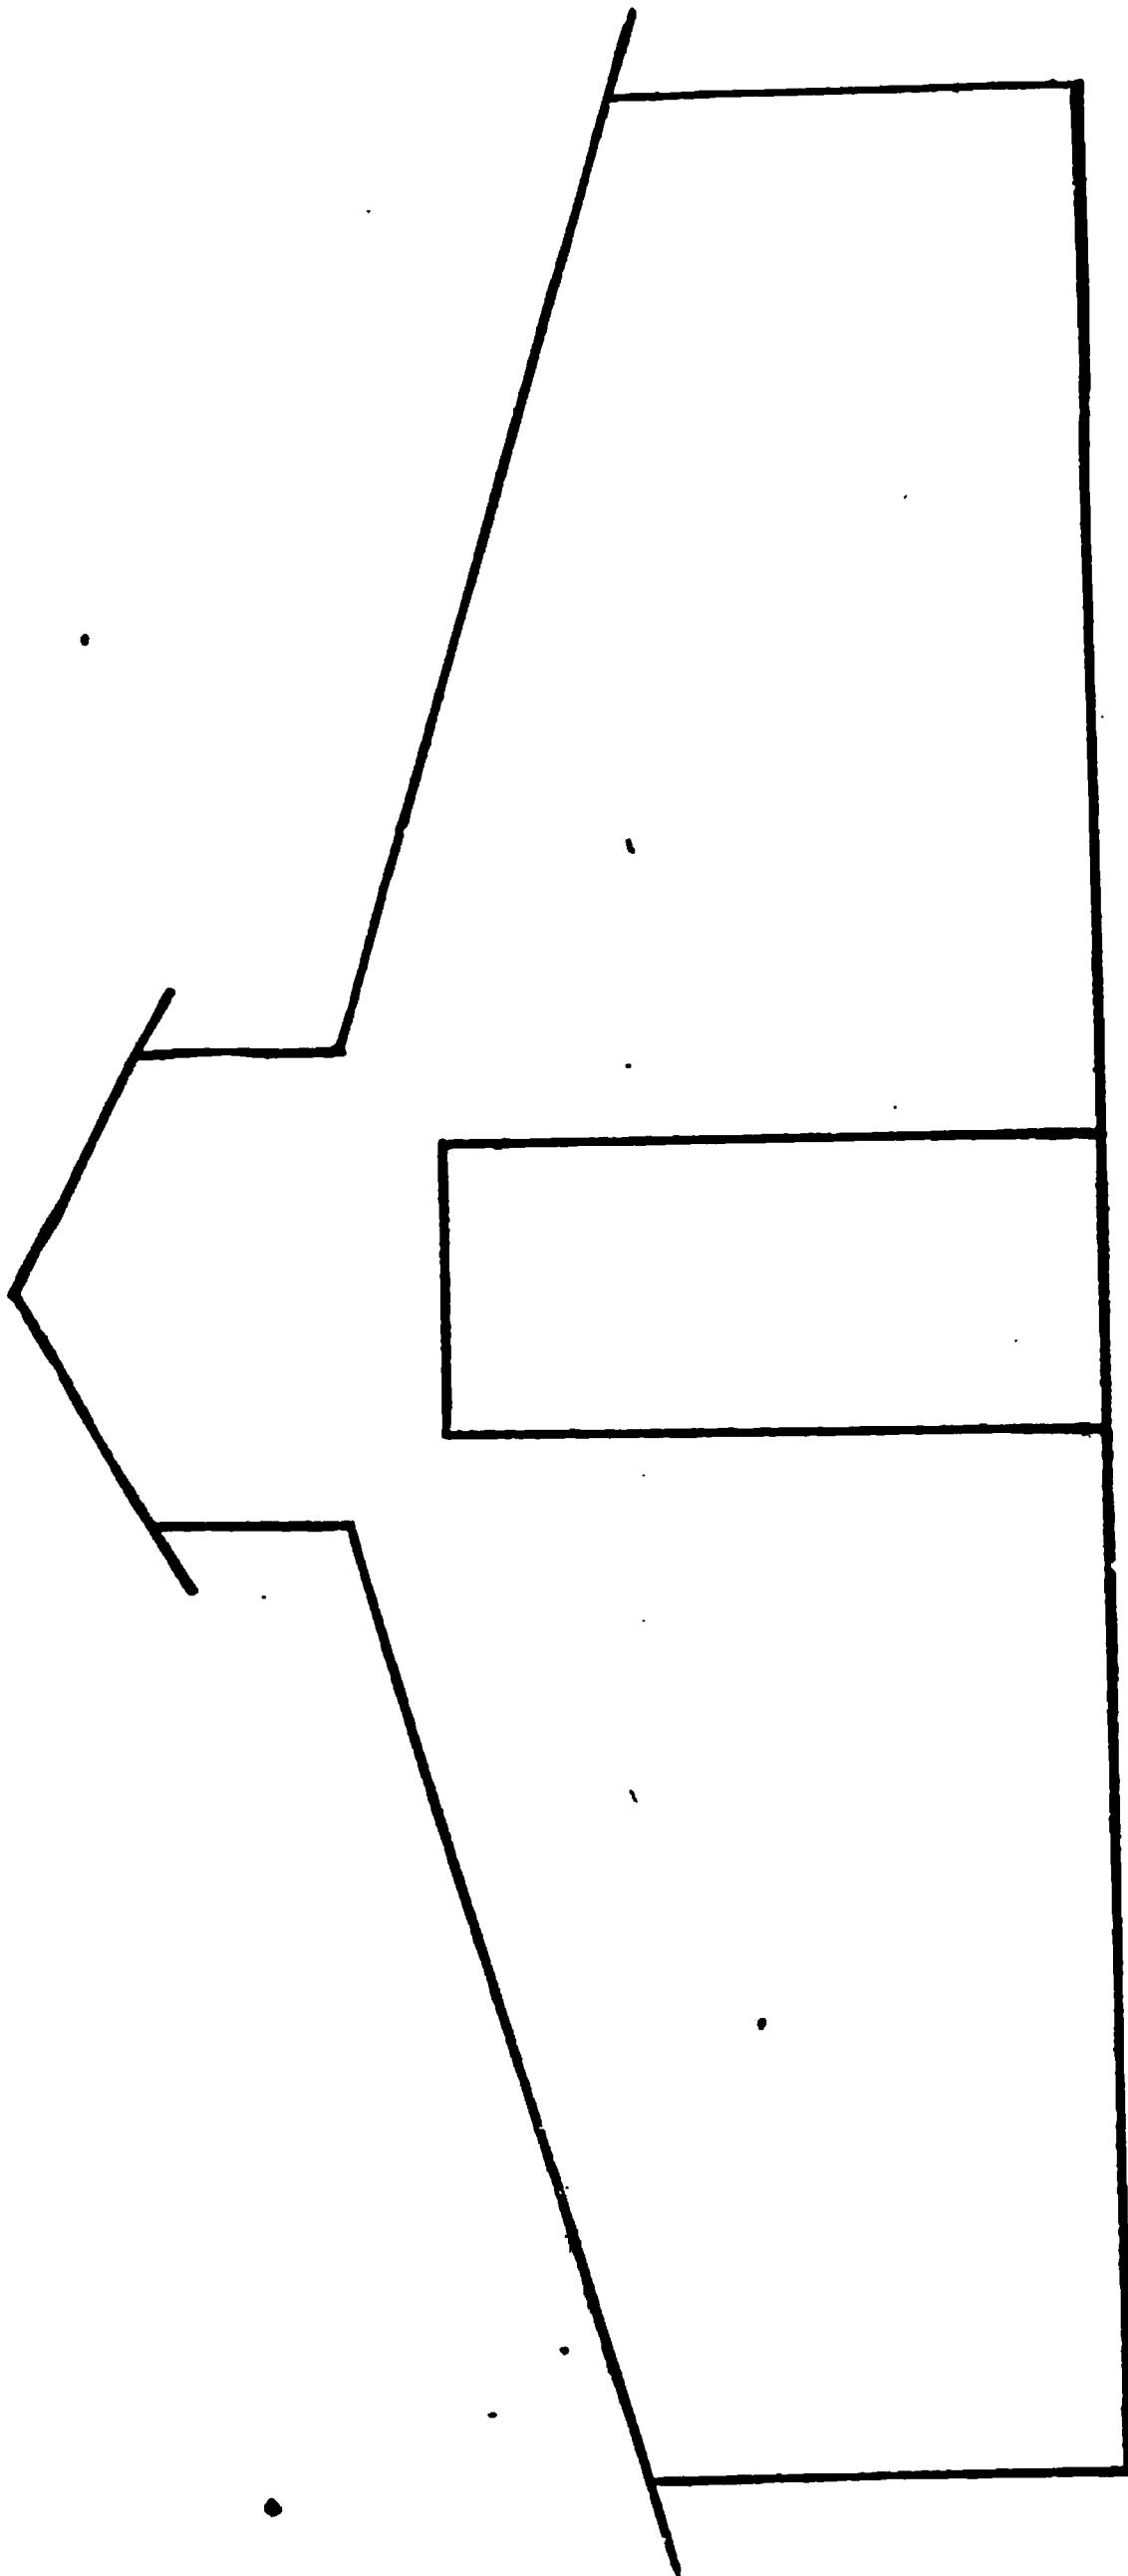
HOG HOUSE—FRONT ELEVATION.
